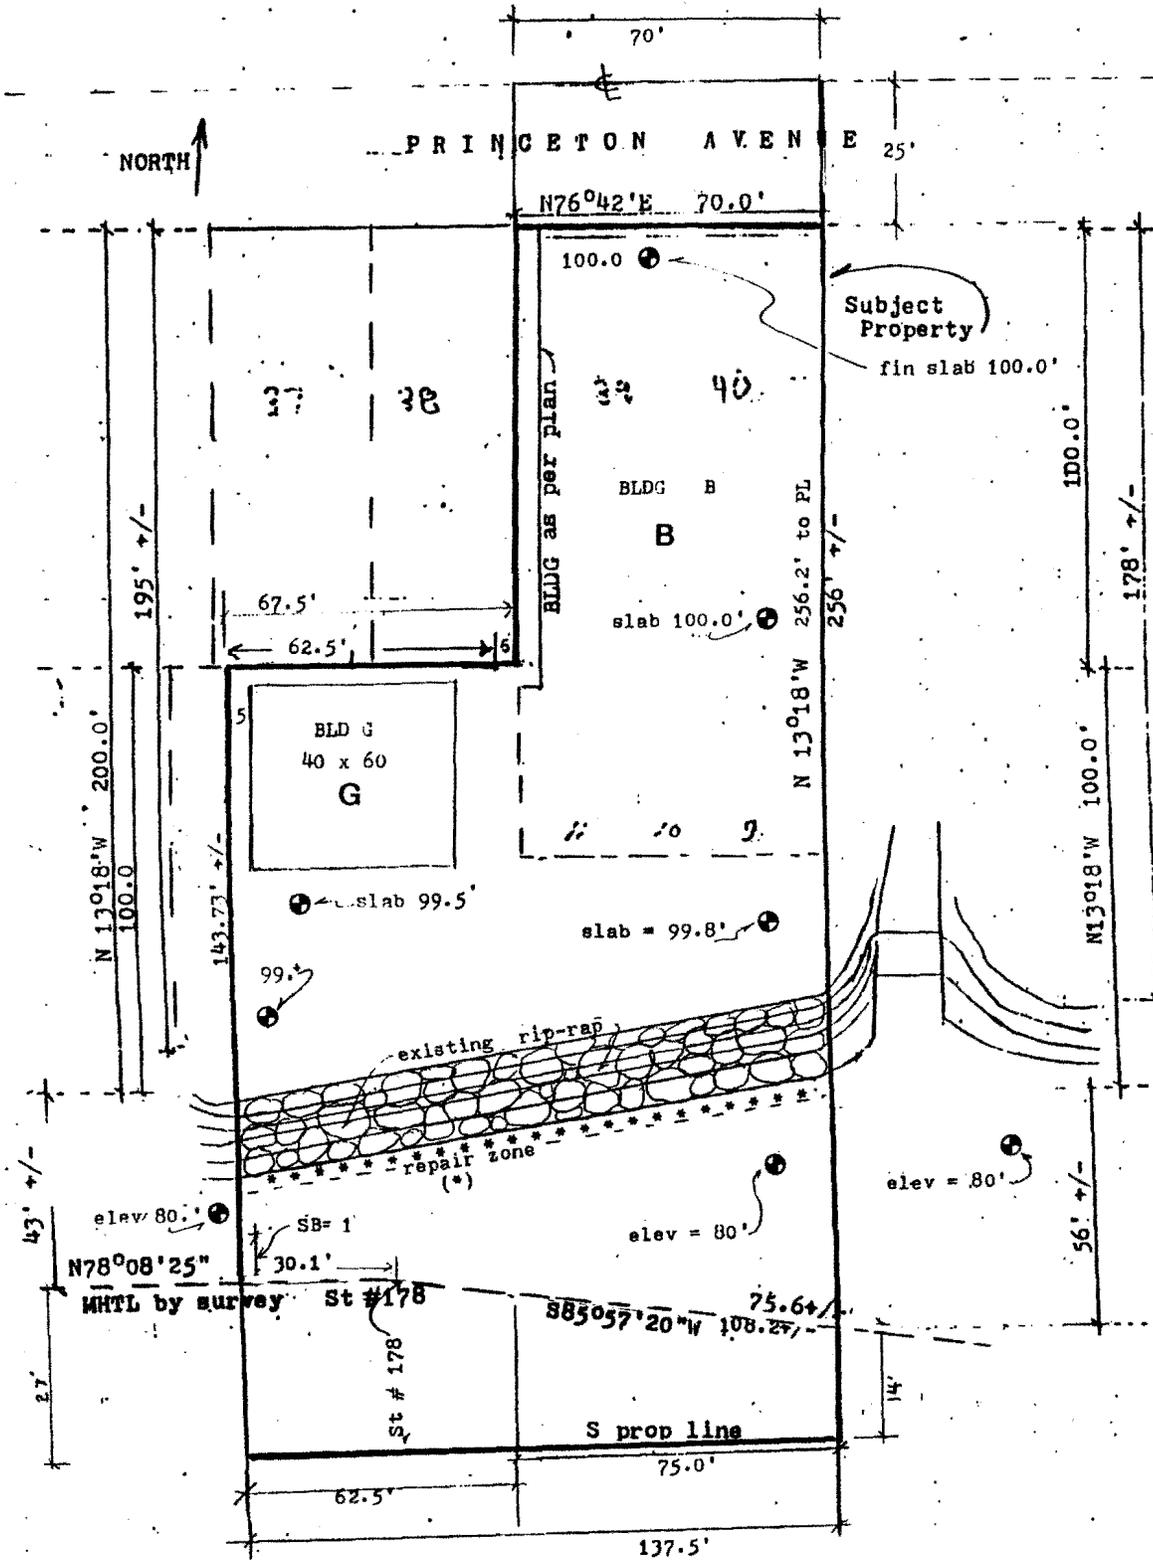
REPAIR PLAN 380 PRINCETON AVE
